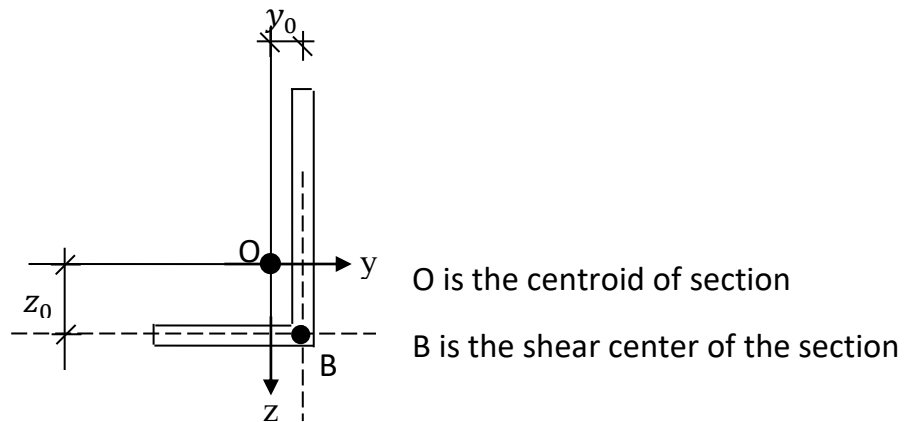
Section s-s (a general unsymmetrical open section)
